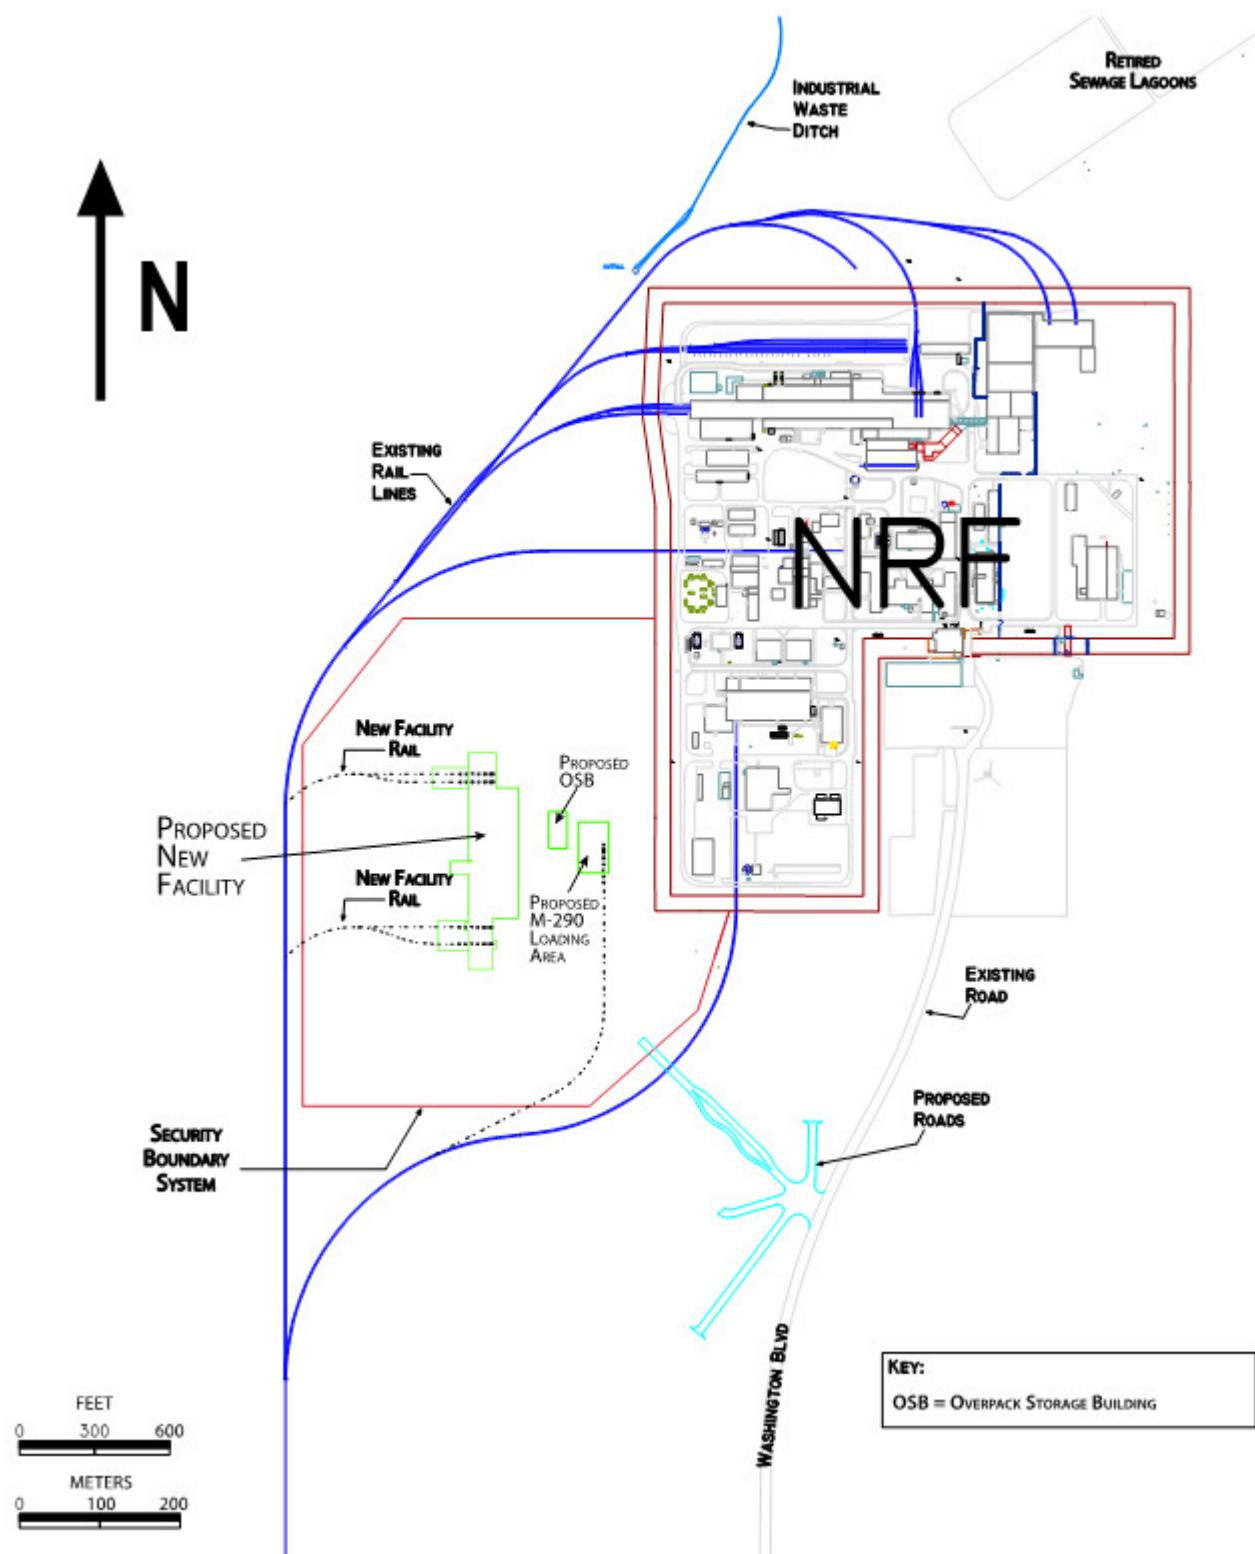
New Security Boundary System for the New Facility Alternative at Location 6
